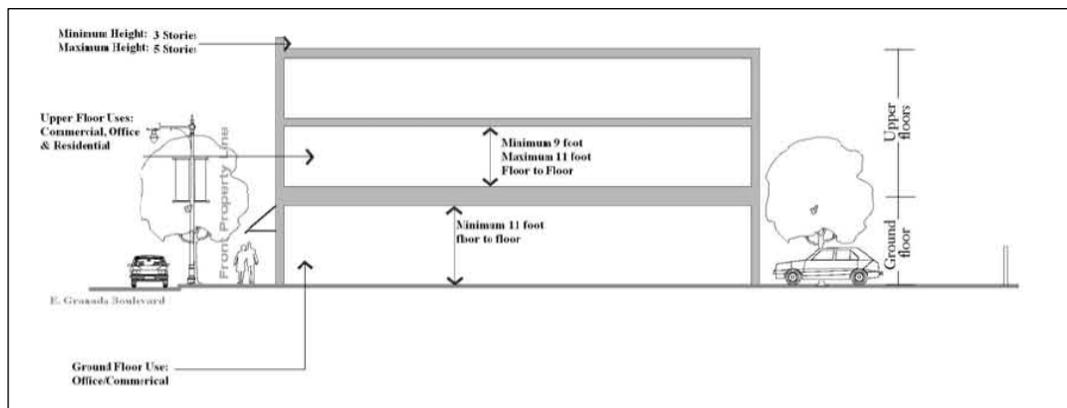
3-5 Story Building x Section Typical *(No change to existing text...)
